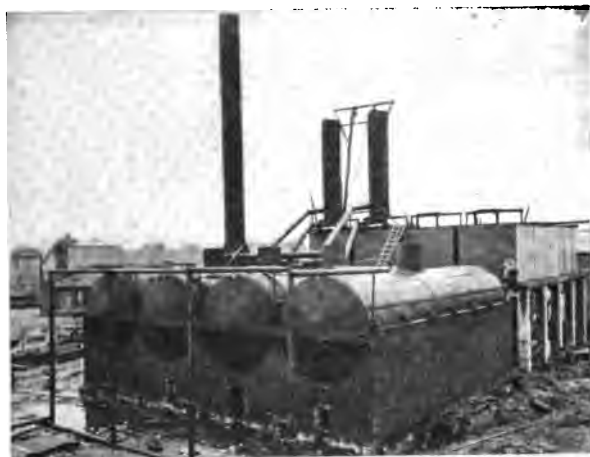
Battery stills on structural steel supports with steel-encased setting.
